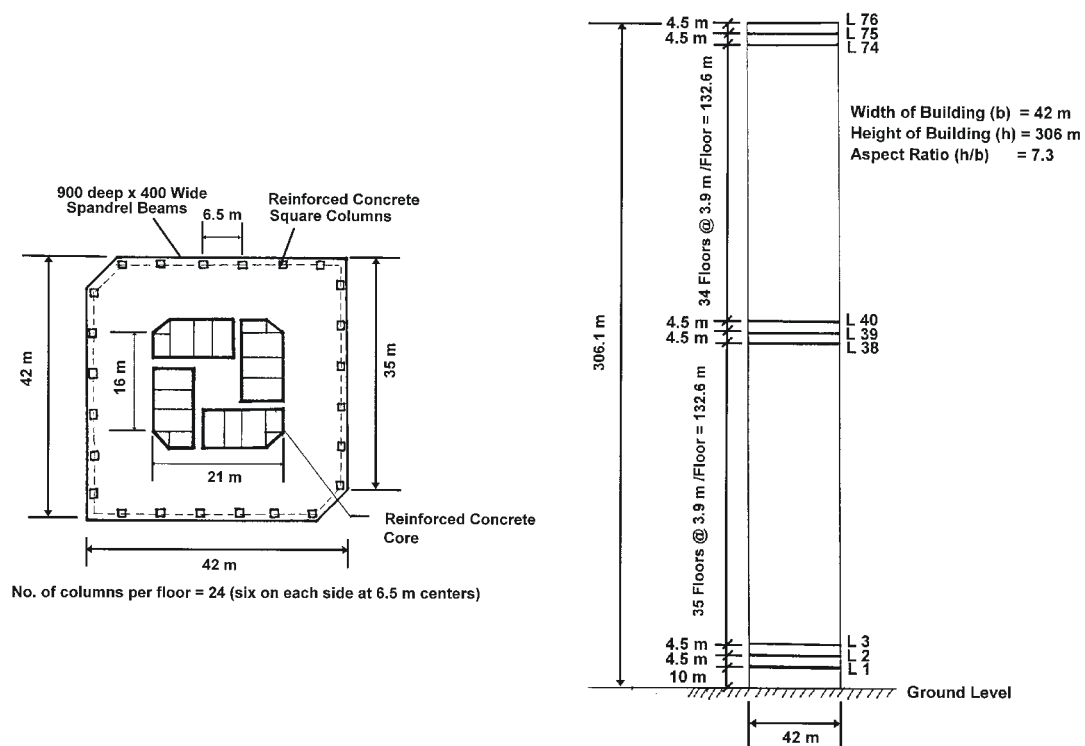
Plan view and elevation view of 76-story building, see Yang et al.²
